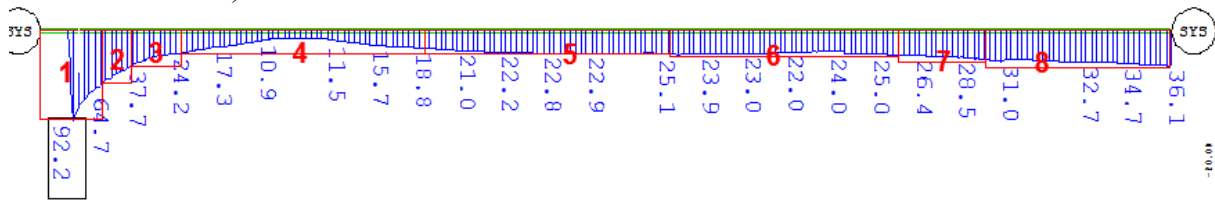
Division of analyzed stirrup reinforcement, cantilever phase, concrete variant
